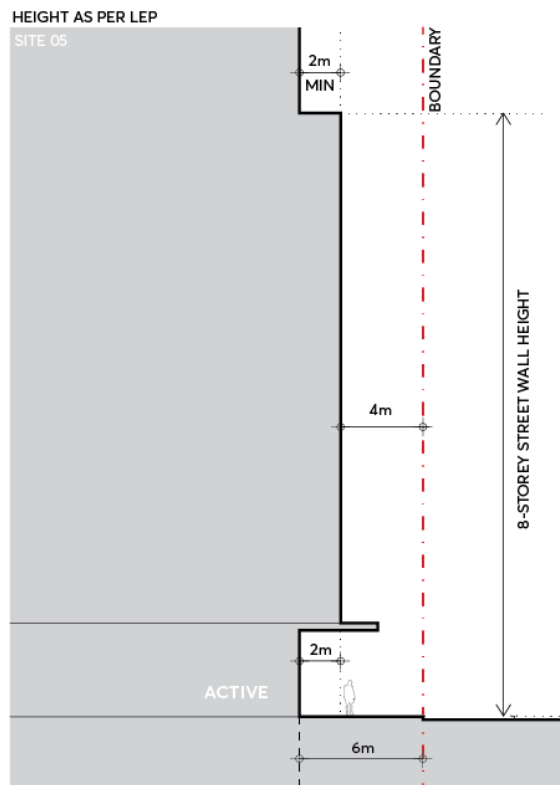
75 George Street at Smith Street (Section G) Setbacks & Street Wall Height
